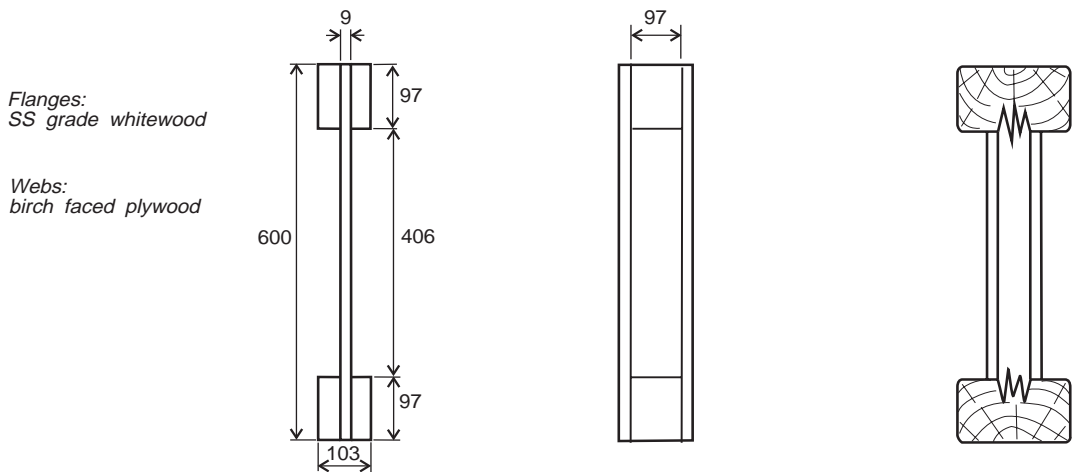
Glued beam types (a) I-beam (b) box beam (c) formwork beam
